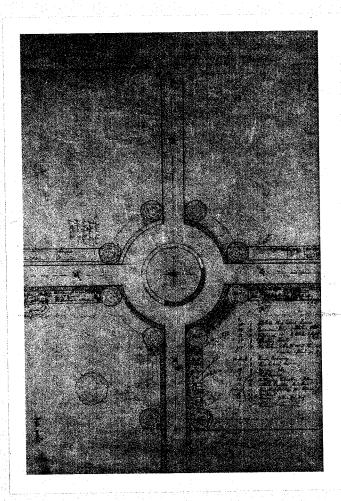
Garden Plan. Drawn by Pierre, circa 1907.
